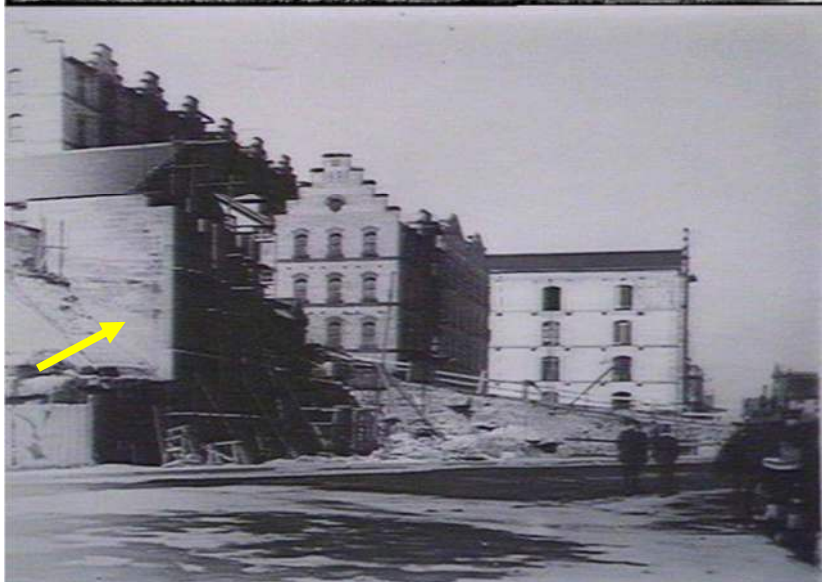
Partial demolition of Grafton Bond Store F (yellow arrow), looking south. The western end of the store was demolished and remodelled to align with Hickson Road. The façade shown in Figure 5.13 was re-facaded onto the remnant structure. SLNSW Government Printing Office 1 - 19861, IE1873931.
